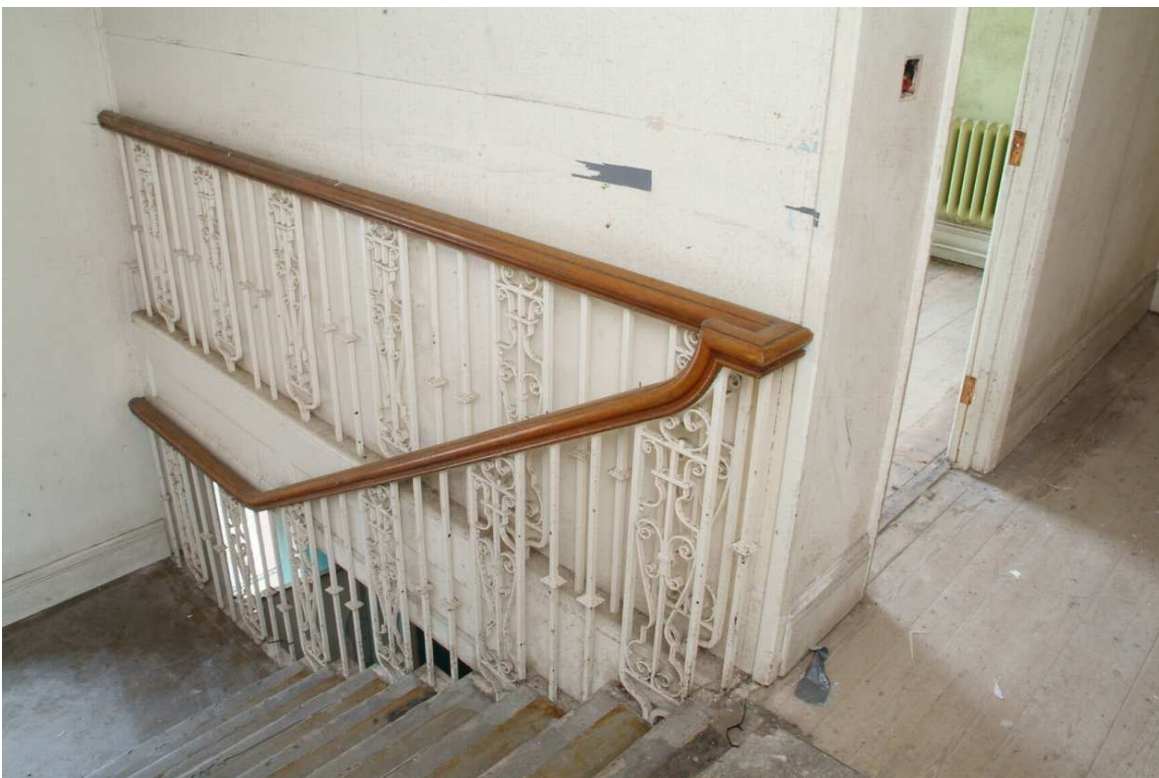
Building 43 - first floor: landing showing balustrade return
